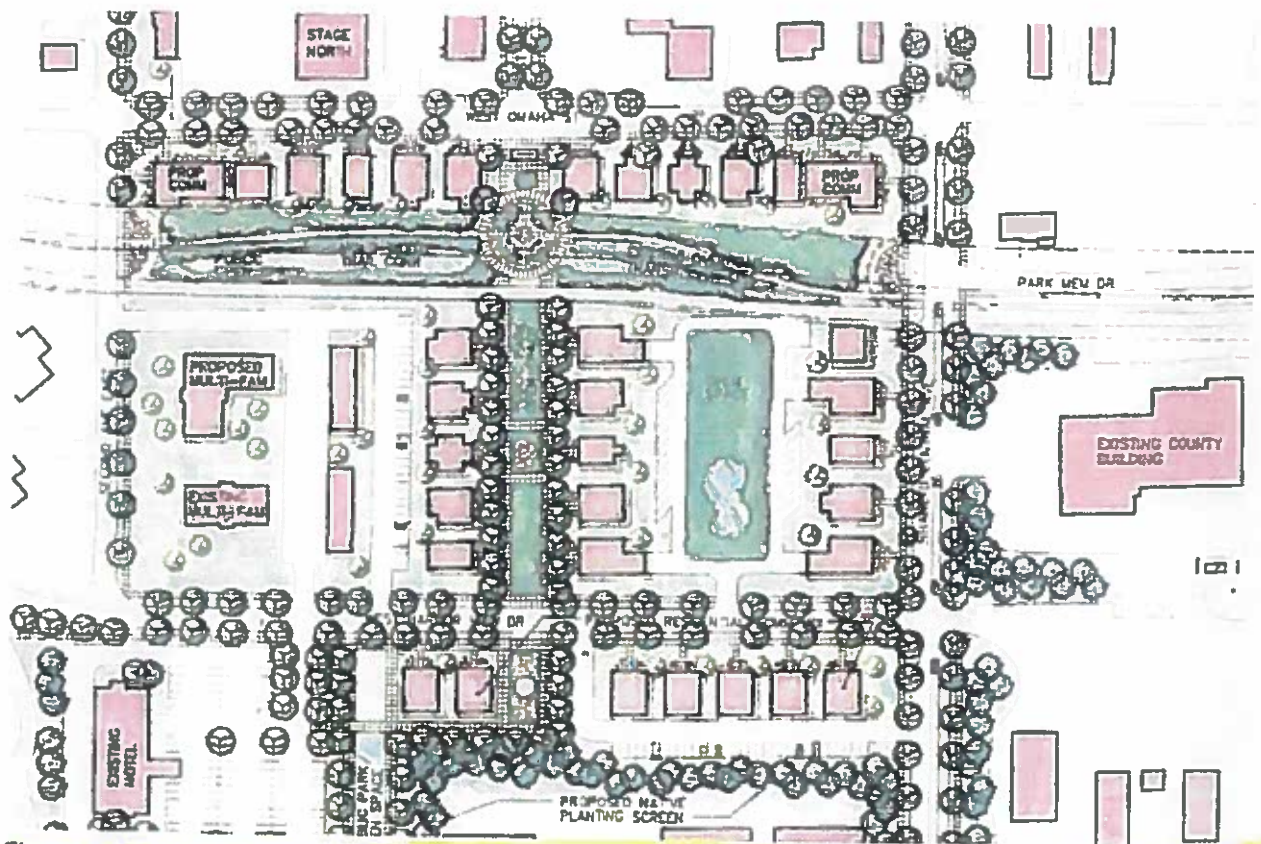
Conceptual Sketch Showing Preliminary Ideas for Redevelopment of Central Avenue from West Omaha Street to West Harbor Drive
